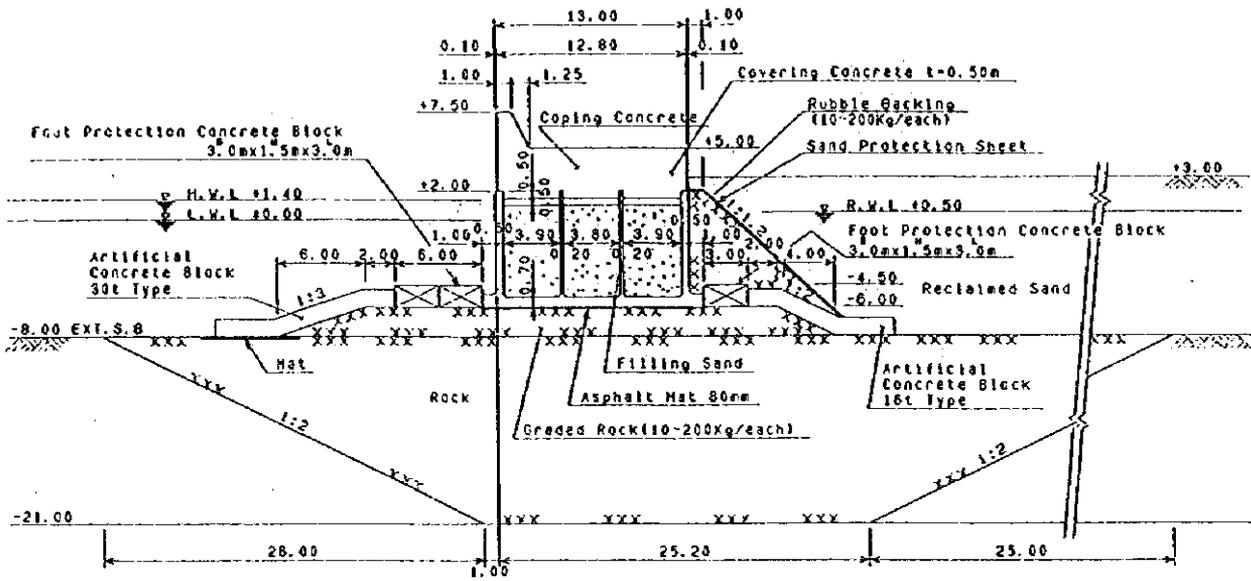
(1) Typical Cross Section of Seawall (RC Caisson)
